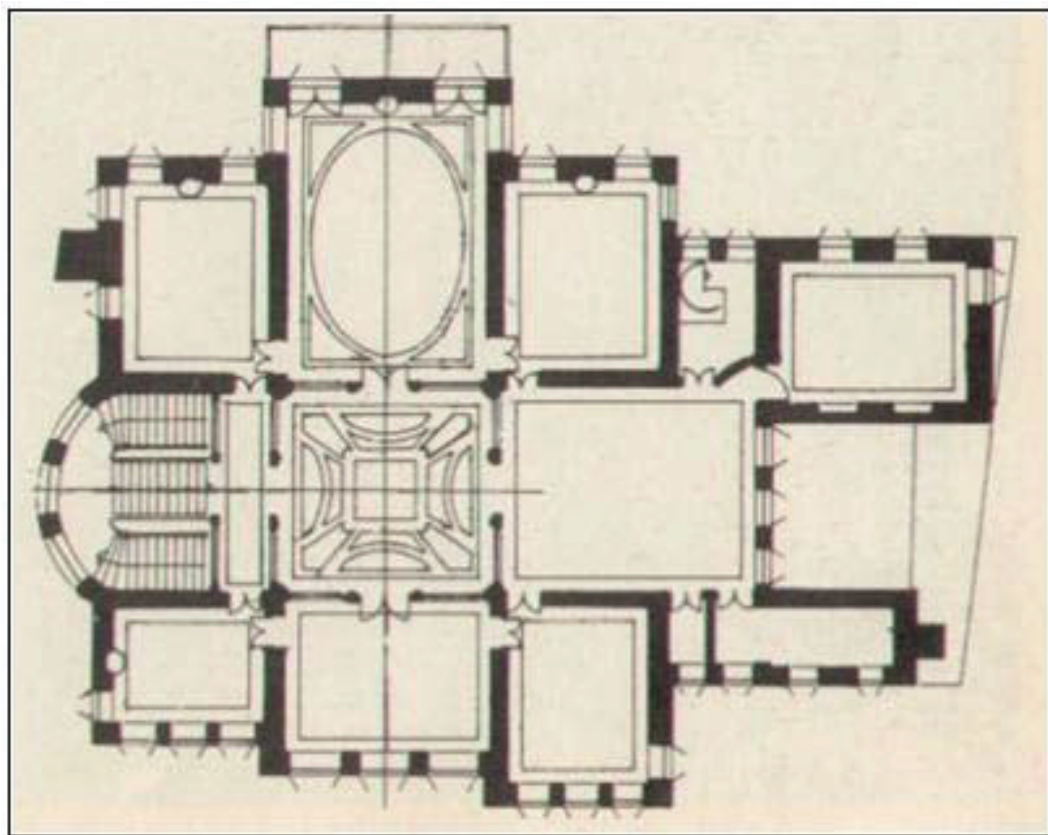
Second floor plan of Suphi Pasha Mansion. ( Source: Eldem 1987, p.264)
